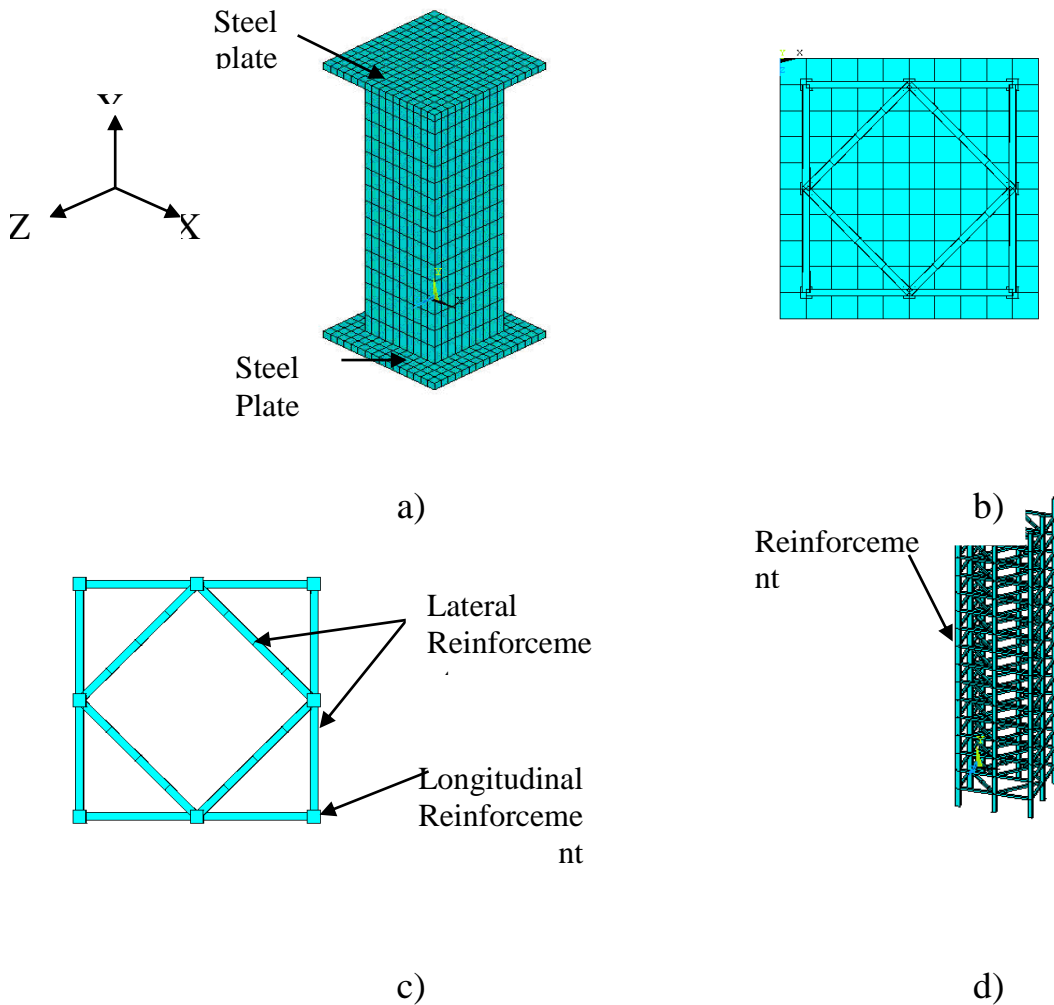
Mesh of Columns: a) Concrete Column 3D View, b) Cross Section in Column, c) Cross Section in Reinforcement, d) 3D view in Reinforcement.
